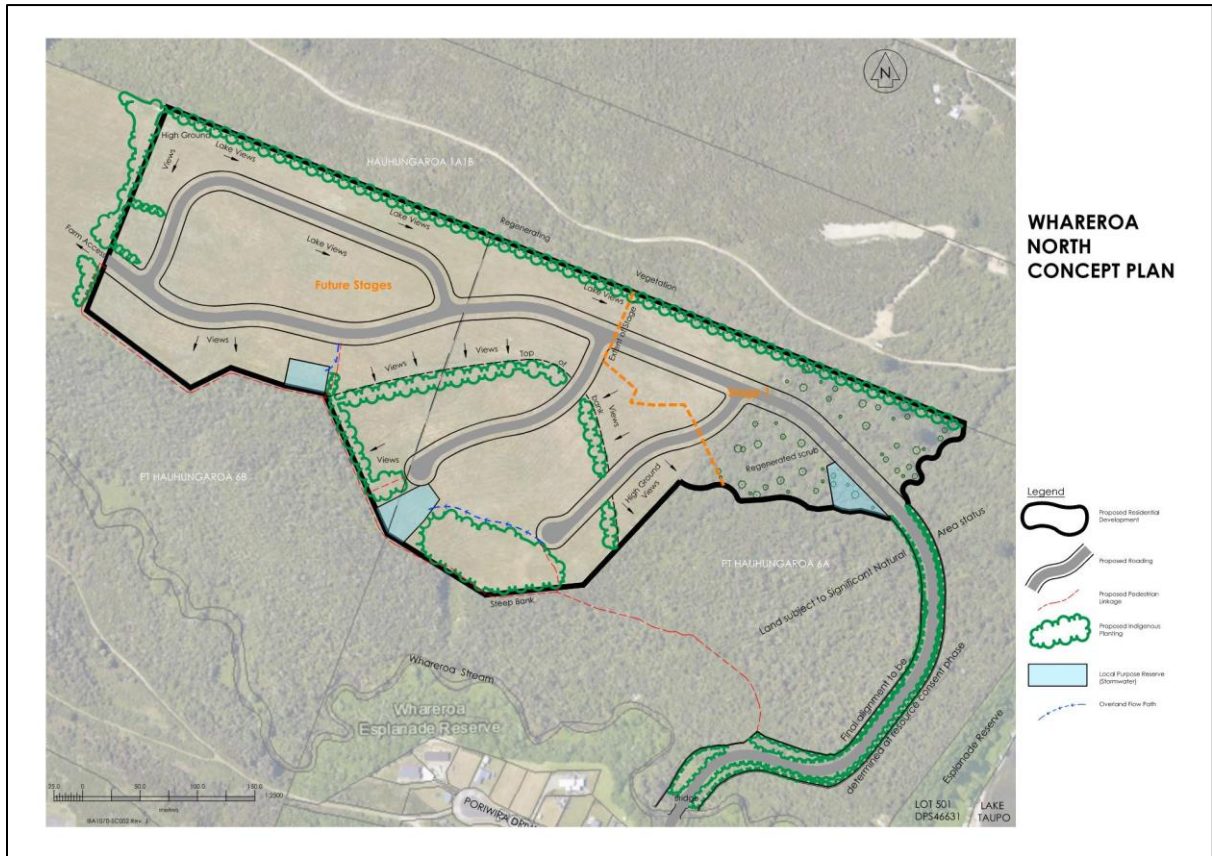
Whareroa North Concept Plan (Inserted District Plan: Appendix 8) – As amended.
